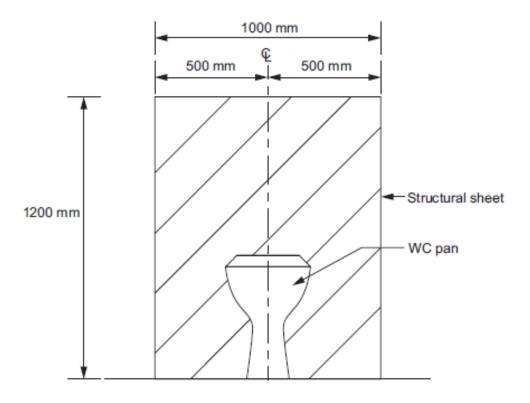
Location of sheeting for a wall behind a toilet pan
